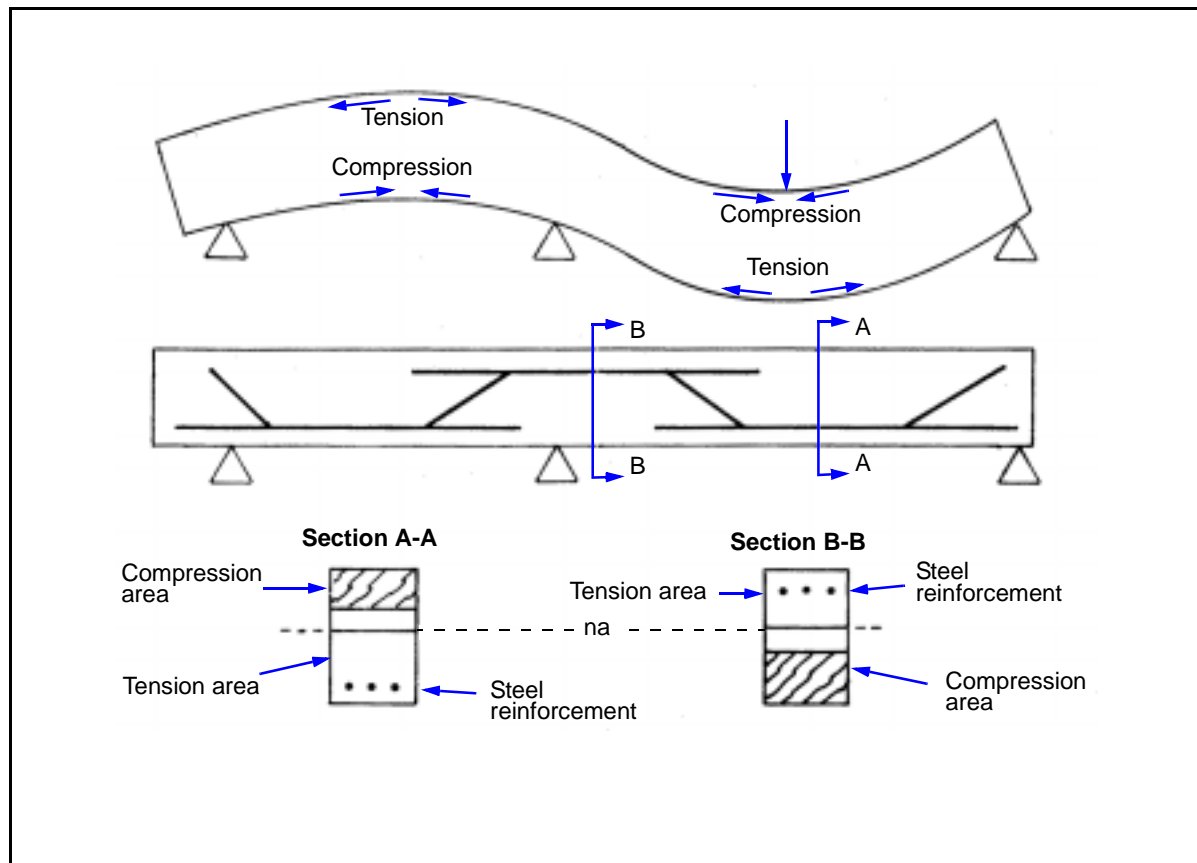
Reinforcement Placement in Continuous Beams or Slabs
